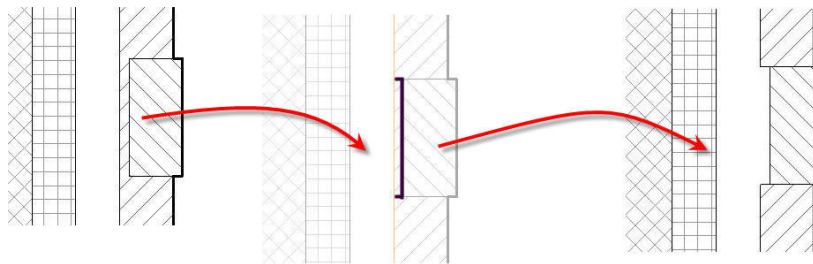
Modifying the brick at the soldier course using the Cut Profile tool.
